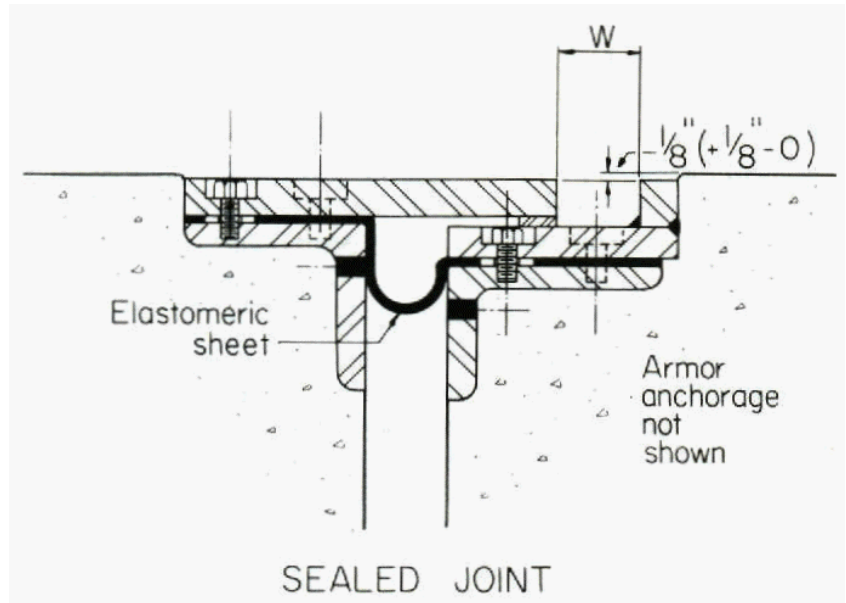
Cross Section of a Sliding Plate Joint
